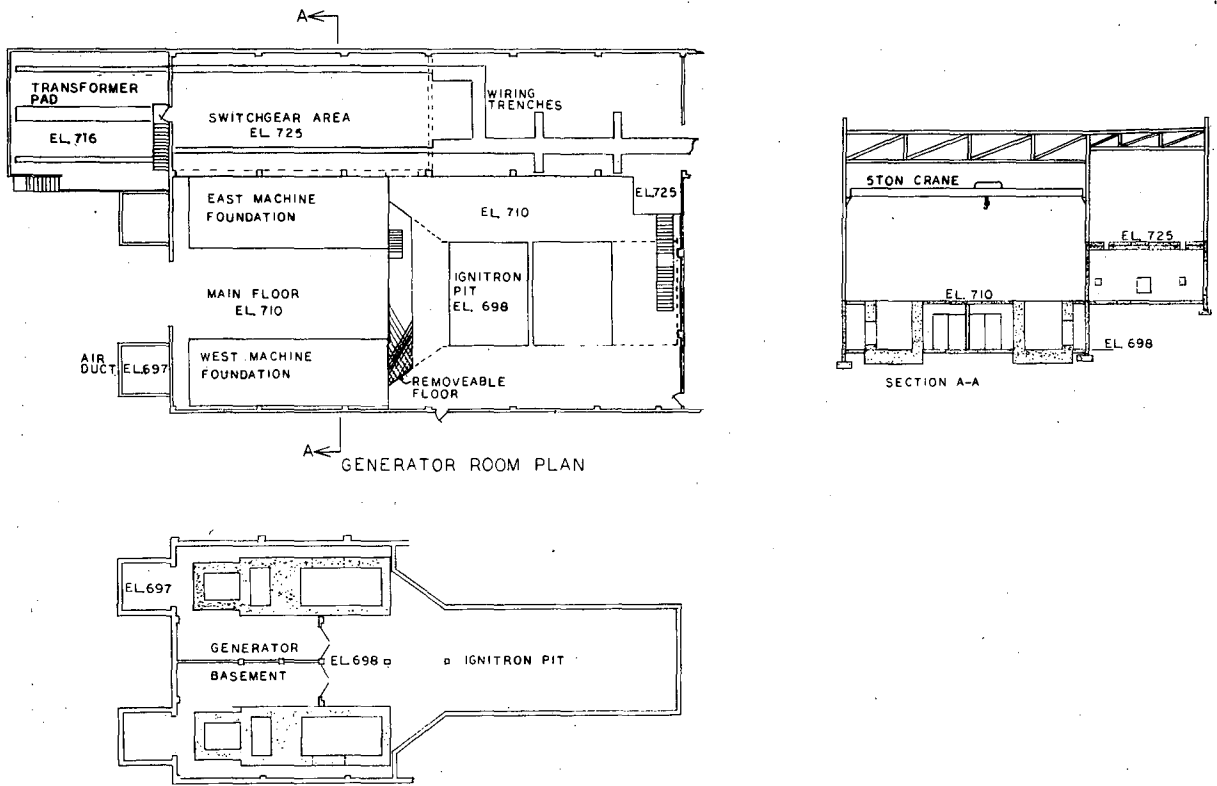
Floor plan and section of generator room, showing locations and elevations of different floors.
